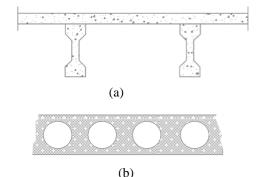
(a) I-girder slab system and (b) Hollow core slab sections
